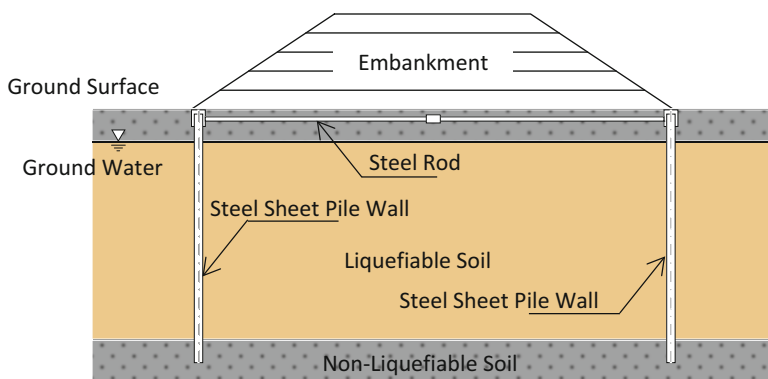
Reinforcement of embankments by sheet pile wall
